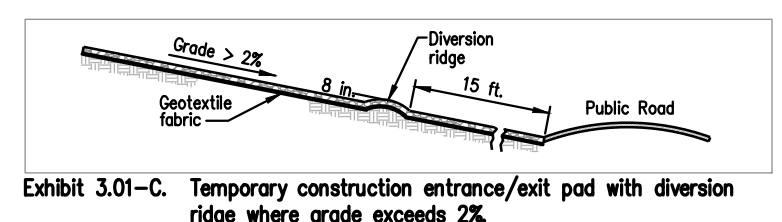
C. Temporary construction entrance/exit pad with diversion ridge where grade exceeds 2%.
